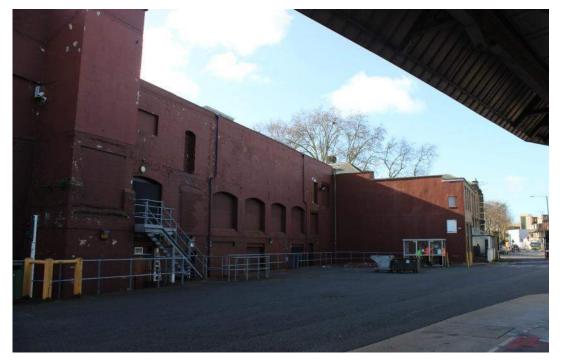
Northern, internal elevation of the former Bottling building (2017)
